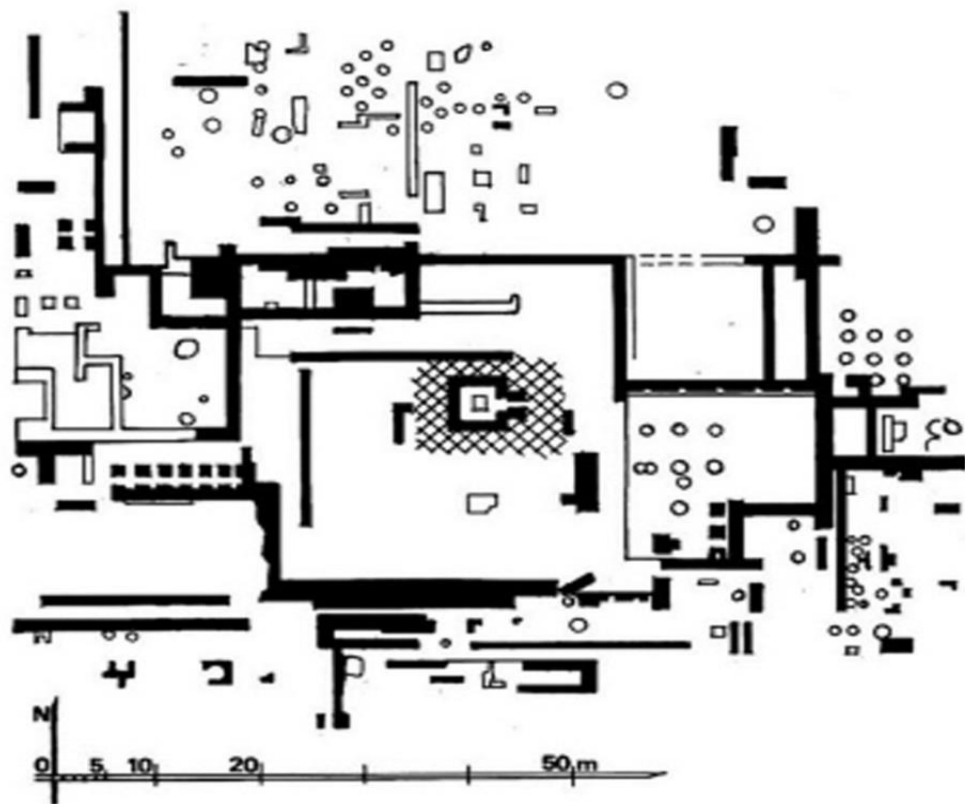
Kyansittha Palace Site (No.1590), Wooden Palace with brick foundation, 11th century CE
